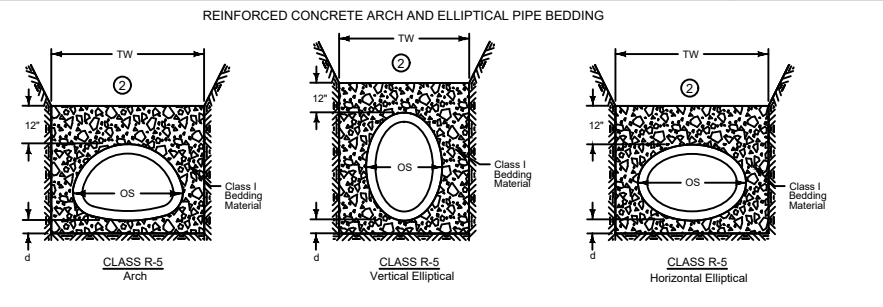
STANDARD ROAD PLAN SW-102 SHEET 1 of 2
